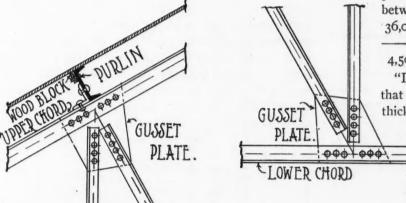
A Typical Upper Chord Joint. where a single angle is riveted to a plate.
